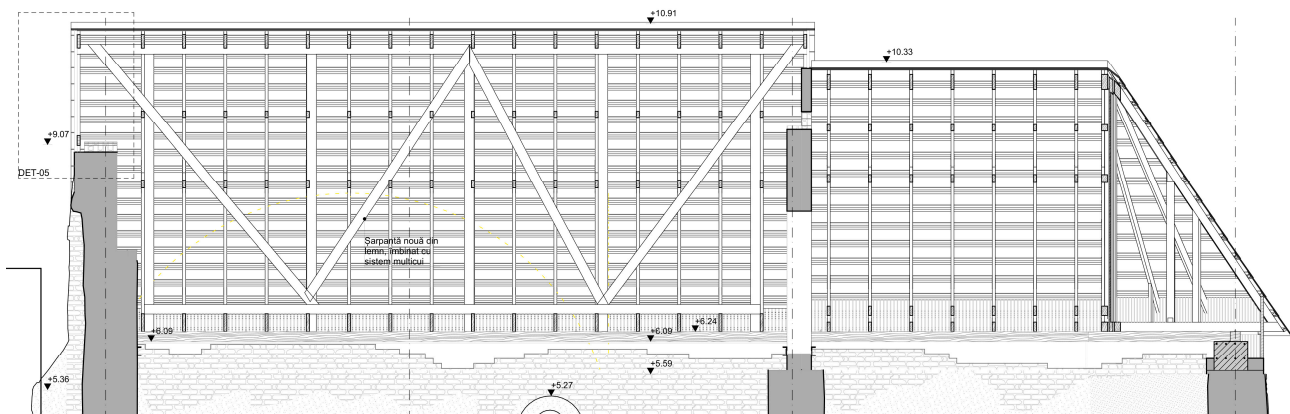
Păuca' reformed church. Proposal for the protective roof structure. Longitudinal section (courtesy of Planus BBM—Mossfern, arch. Macalik Arnold, arch. Szilágyi-Bartha József).
